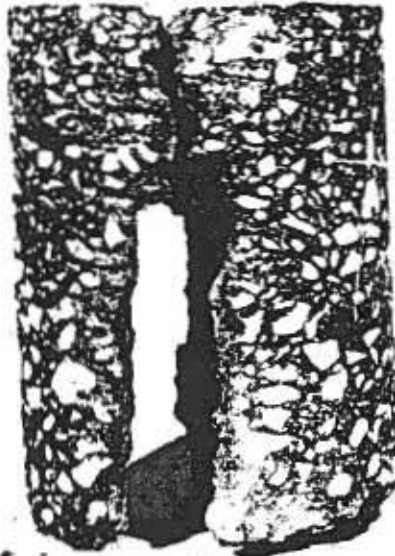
PAVEMENT DETERIORATION BENEATH THE SURFACE CRACK
